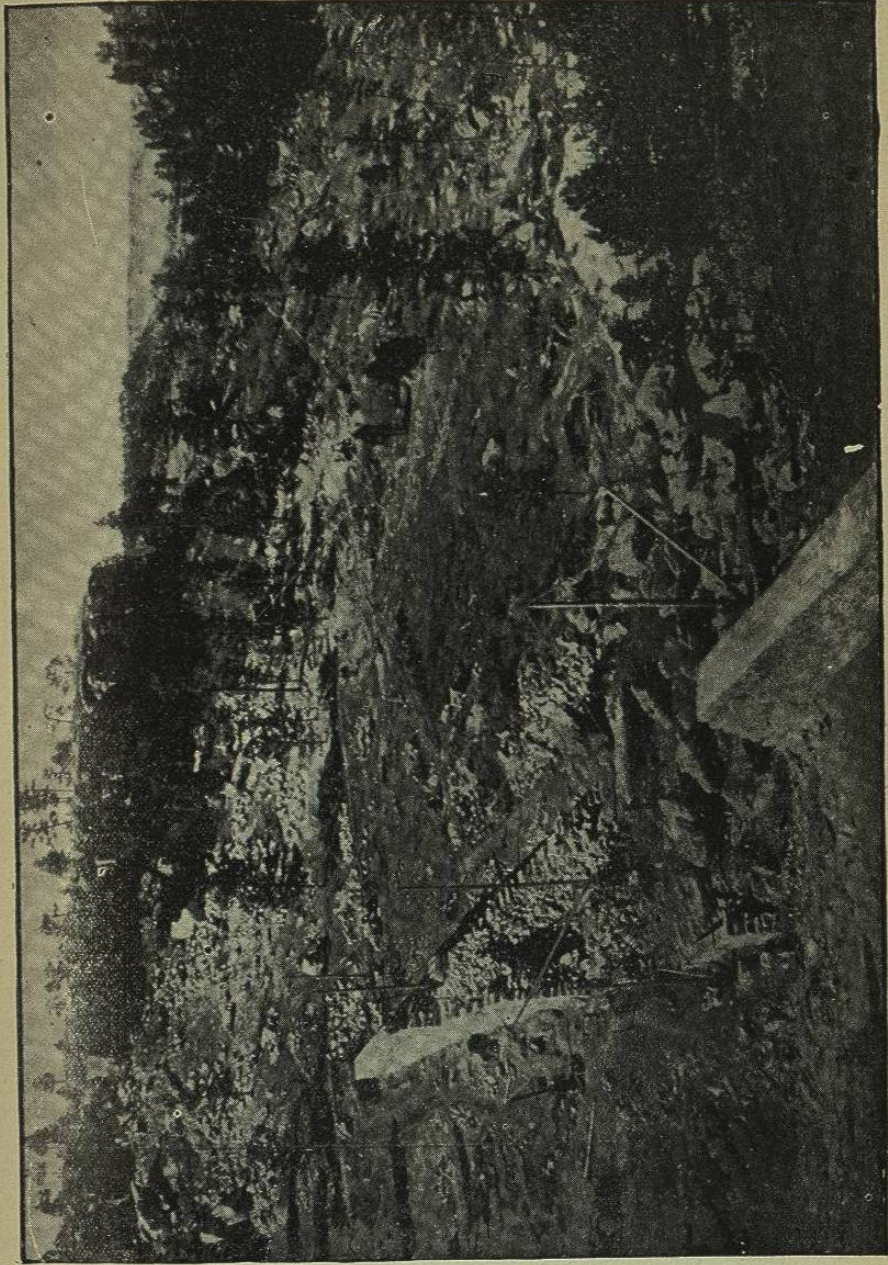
VIEW OF CASTLEWOOD DAM, COLO., DURING CONSTRUCTION, LOOKING NORTH.
